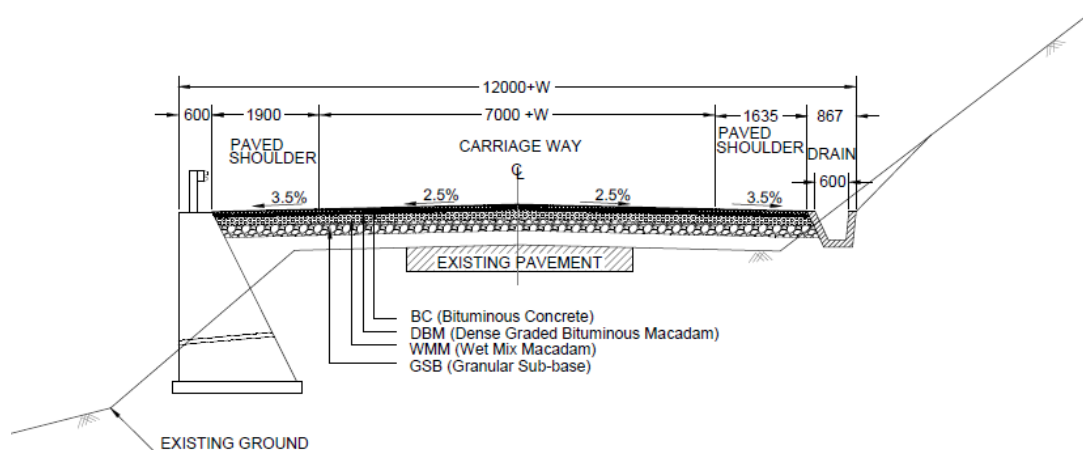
(8): Typical Cross Section – Pavement Structure in Widening Primarily to Valley Side
